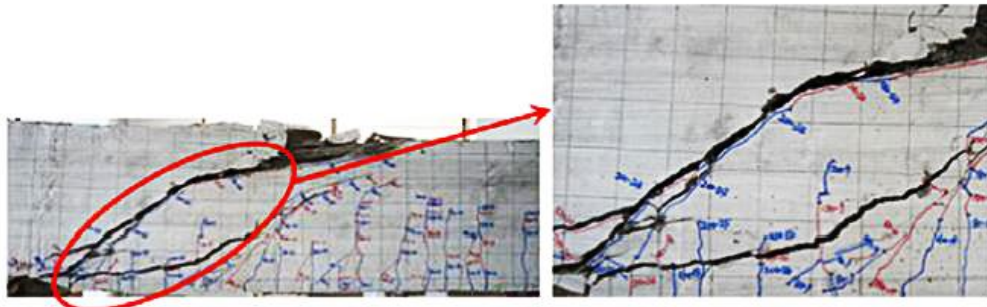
(a) illustrates the failure pattern of SCC beam which doesn't have fibers. By developing and widening of diagonal cracks, the resistance of beam decreases abruptly. Near the longitudinal reinforcement the dowel failure and concrete spalling action can be observed. The following explanations have been taken by comparing two beams (SCC and FRSCC) from Figure 17 (a) and (b).
